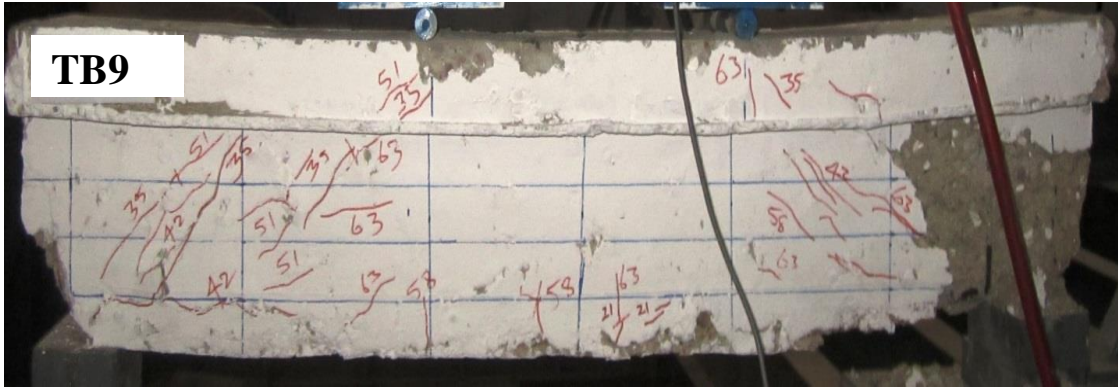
Failure pattern of 900° C heat damaged beams
